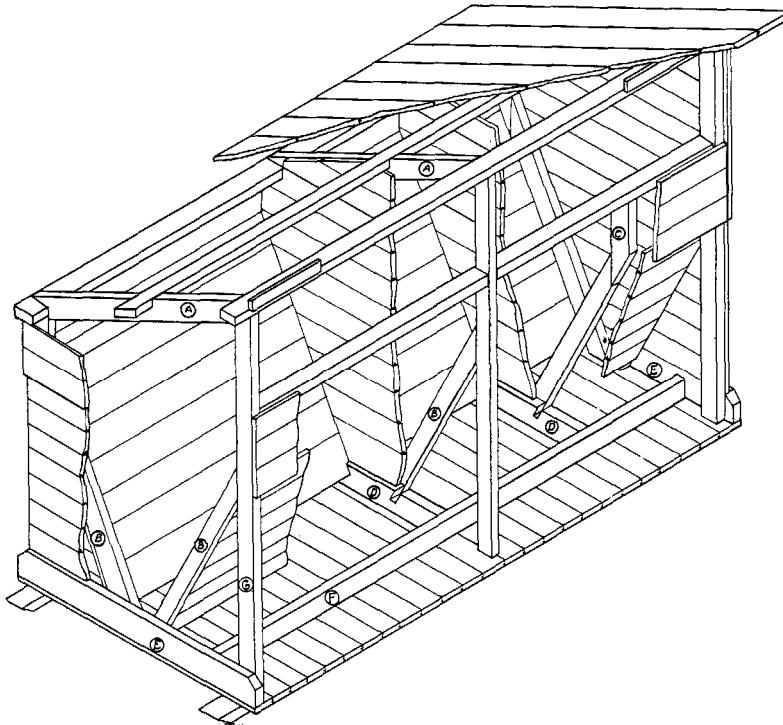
Large type feeder. This feeder is designed to hold a larger supply of feed than the one shown in figure 15.
